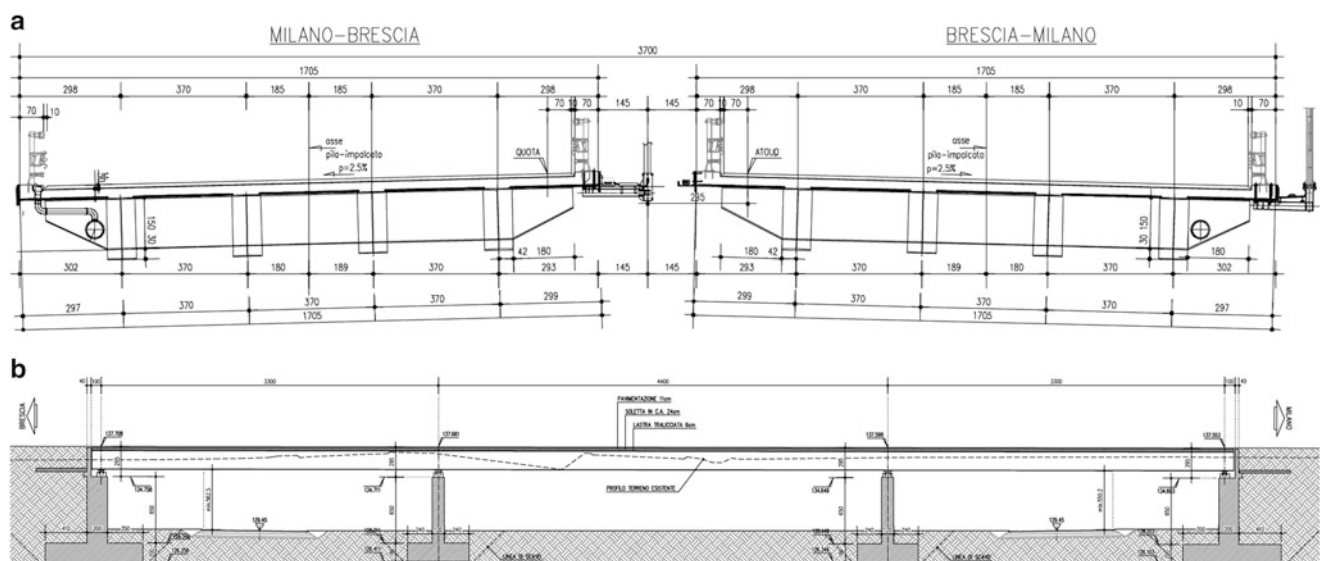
VX bridge, (a) cross section (b) longitudinal section
